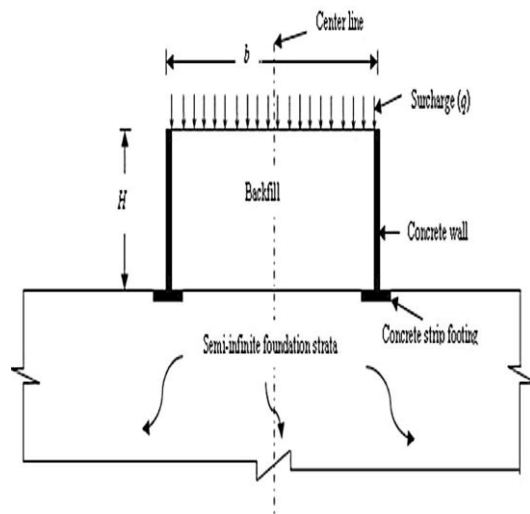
Typical cross-section of a rigid wall with reinforced backfill
